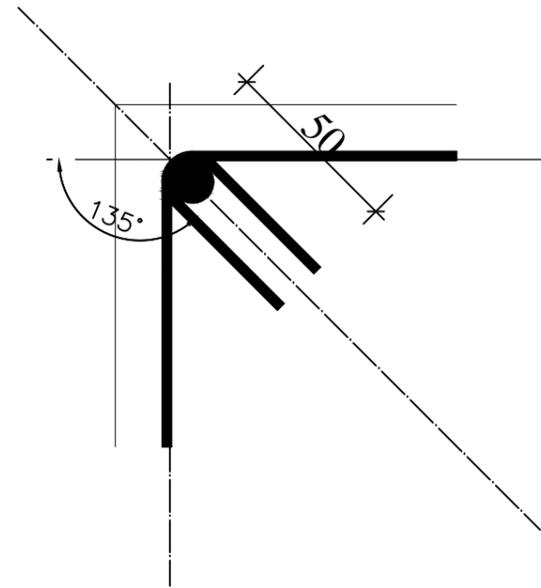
DETAIL OF VERTICAL BARS ON EITHER SIDE OF THE WINDOW
